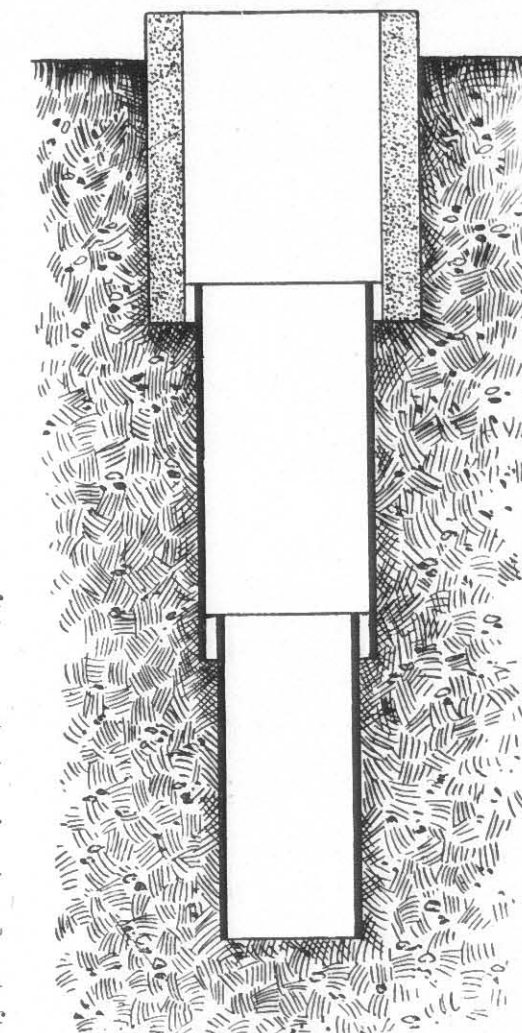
Vertical Section of Well constructed of Concrete and Iron Cylinders.
